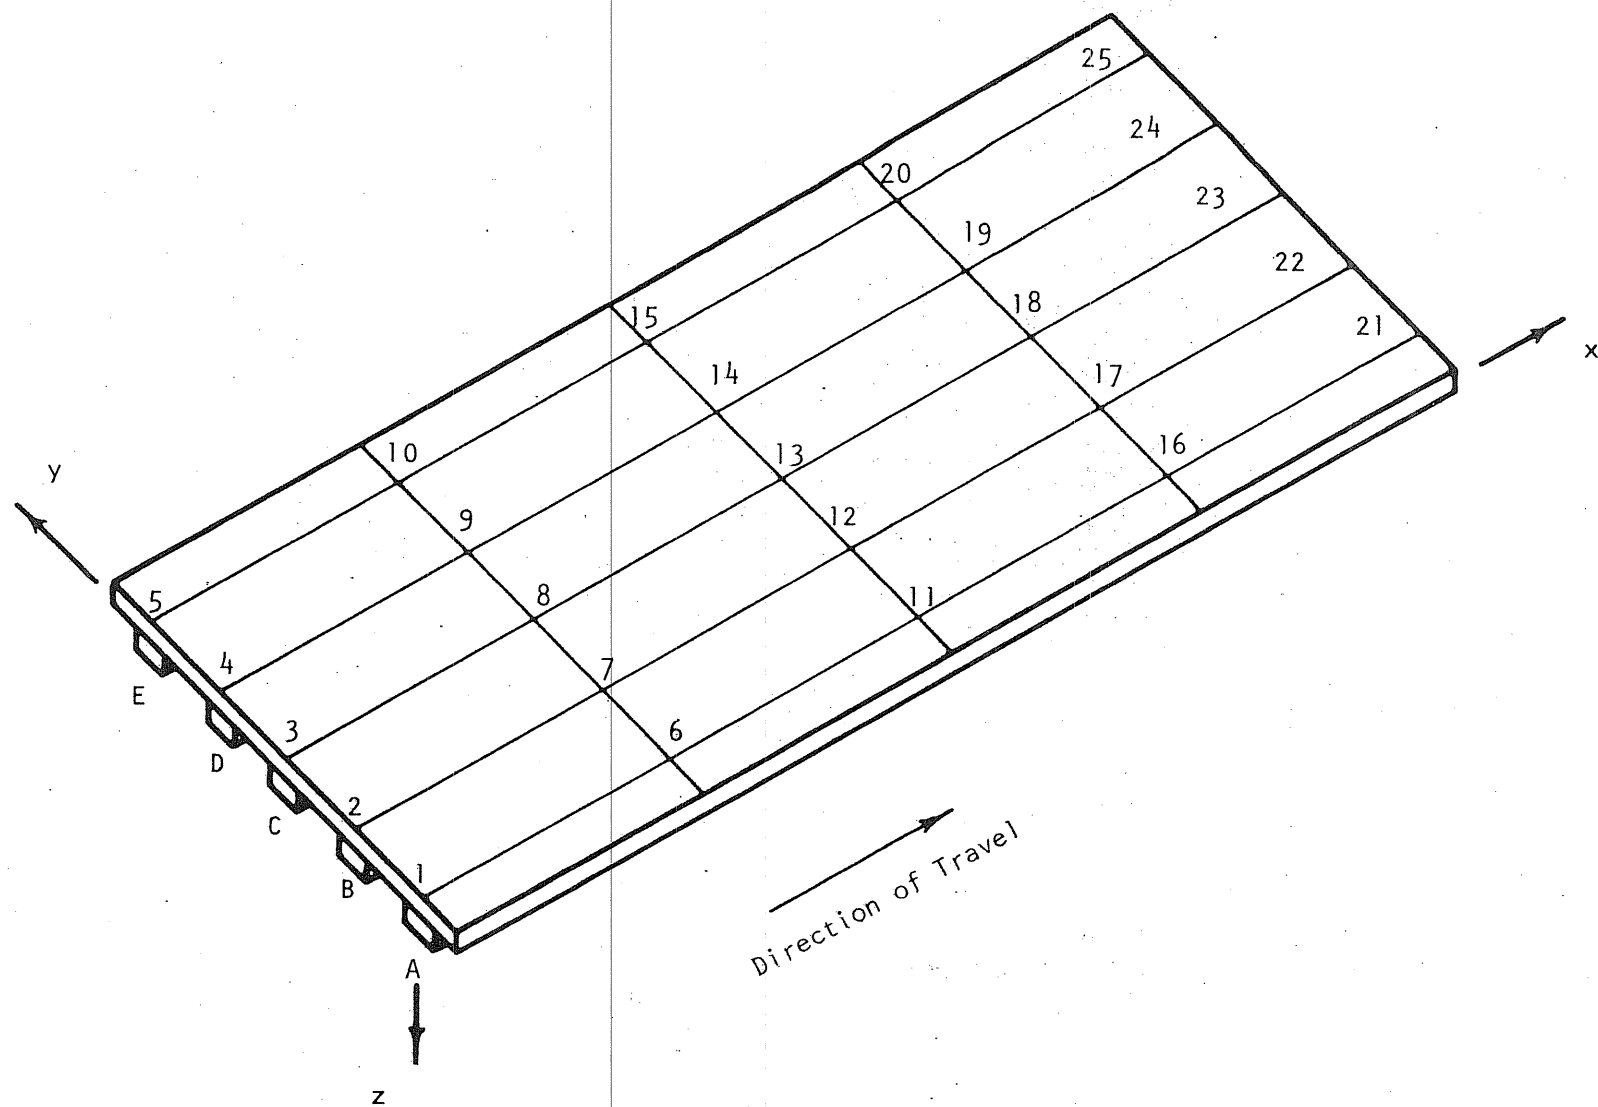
SINGLE-SPAN, FIVE-GIRDER ALUMINUM BRIDGE MODEL
